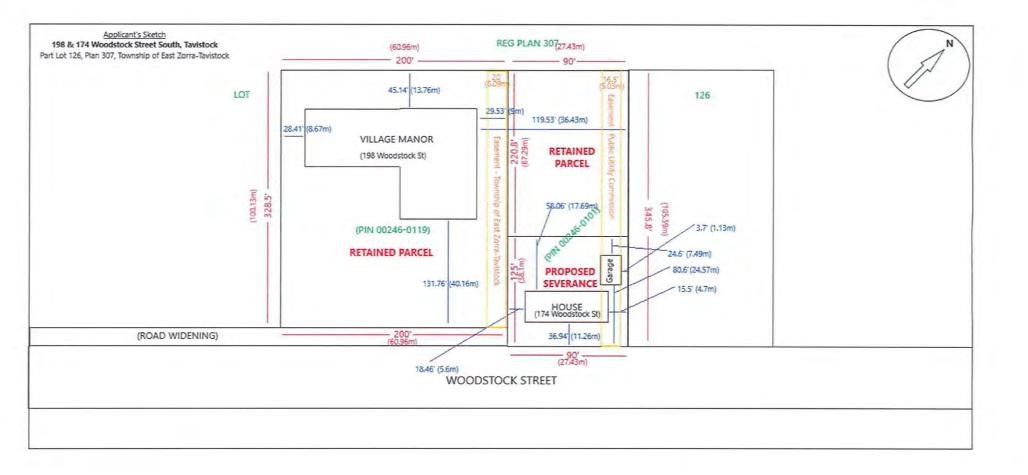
Applicant's Sketch File No. B23-83-2 & ZN2-23-07 (Village Manor Tavistock Inc.) Part Lot 126, Plan 307, Township of East Zorra-Tavistock - 174 & 198 Woodstock Street South
